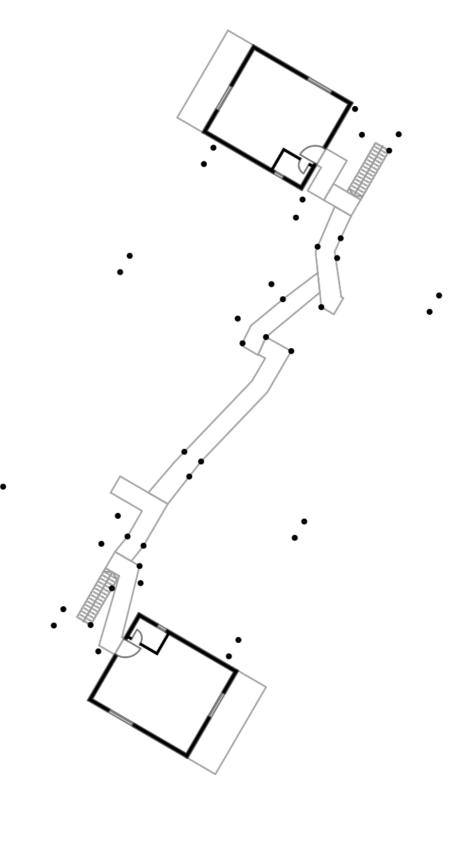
LAYOUT FLOORPLAN 2.FLOOR
